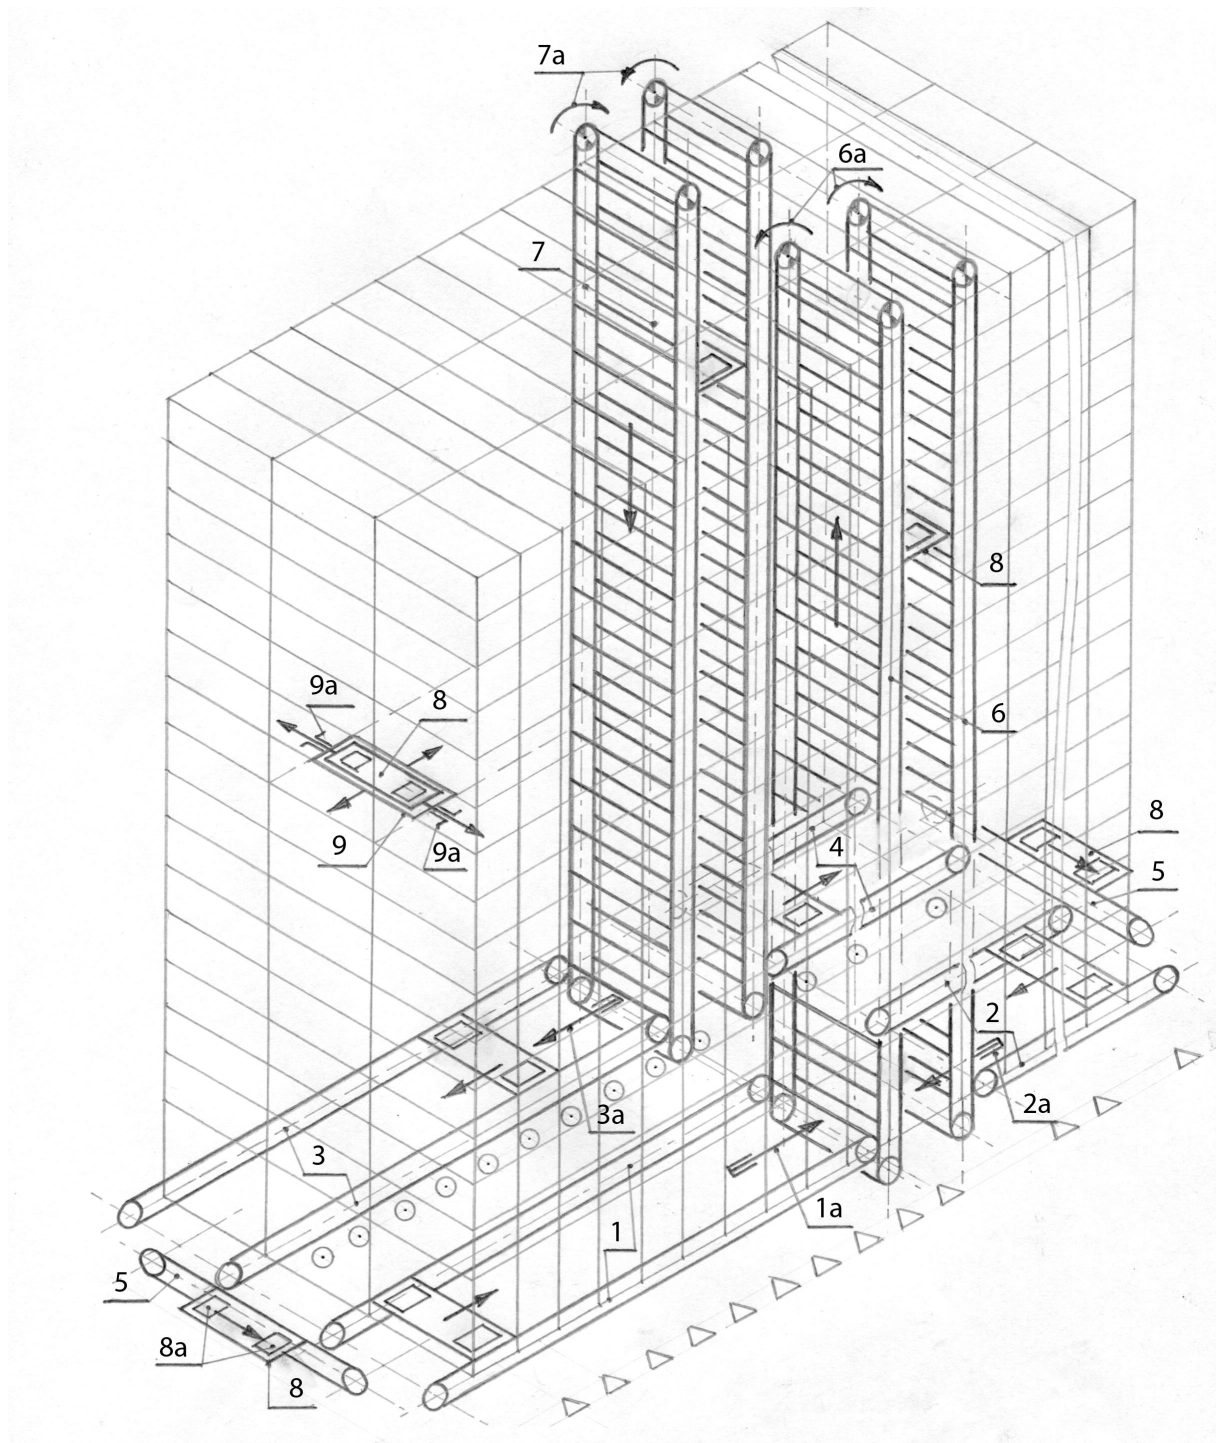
Diagram of the designed garage with basic mechanical devices: 1 – left take-in conveyor, 2 – right take-in conveyor, 3 – left give-out conveyor, 4 – right give-out conveyor, 5 – halfway conveyor, 6 – lift conveyor, 7 – lowering lift, 8 – palette, 9 – platform
